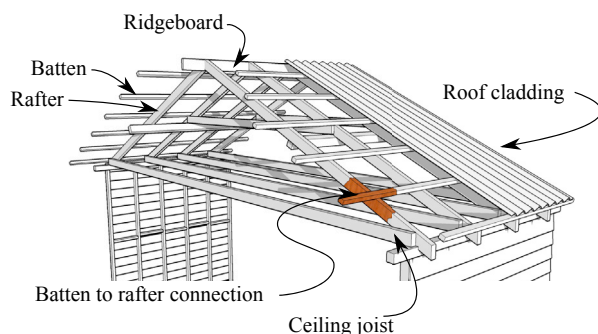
Light framed timber roof structure with corrugated metal roof cladding.
